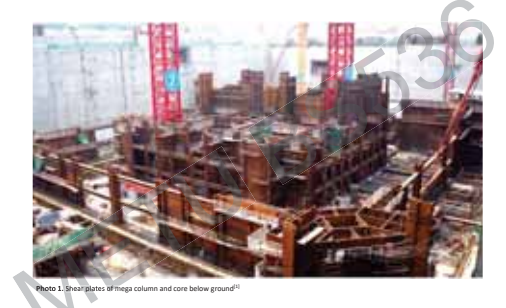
Steel plates of mega column and core below ground<sup>[1]</sup>
